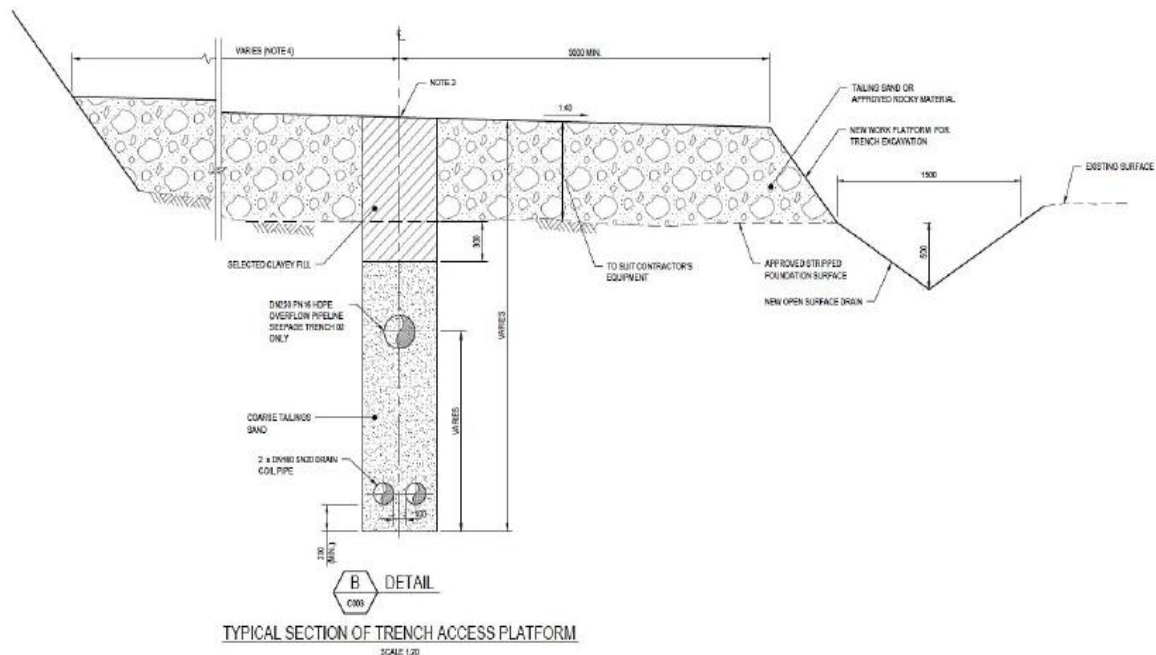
TSF 2 Proposed foundation drainage system (GHD 2015a)
